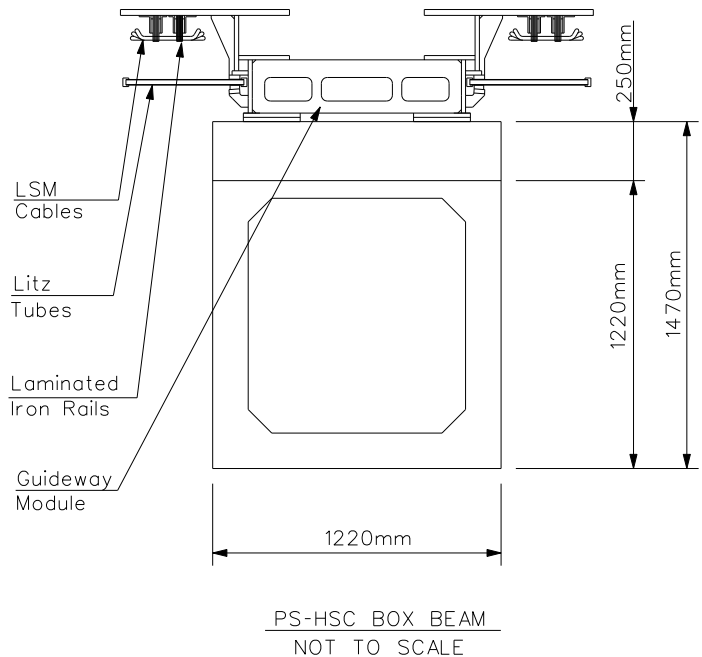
Baseline Box Beam/Guideway Module Cross Section
